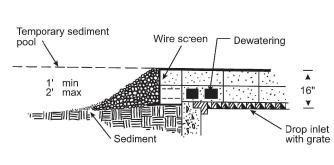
Block and Gravel Drop Inlet Protection
